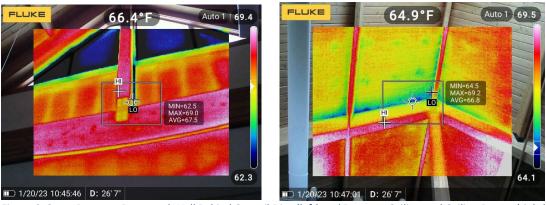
Seam Between Beam and Wall Behind Council Dias (left) and Between Ceiling and Ceiling Beams (right)
